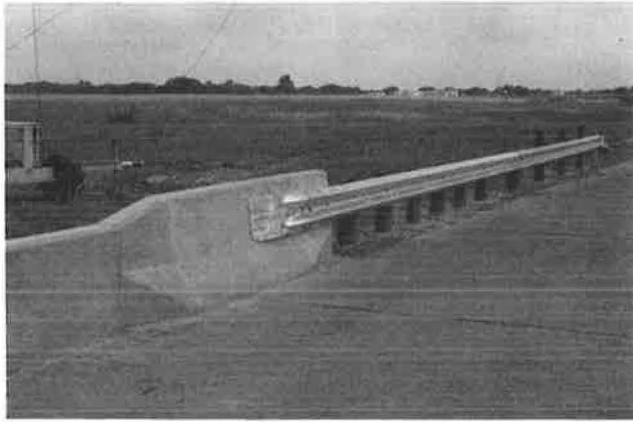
Tubular W-beam transition to CSSB, Test 2 installation.
